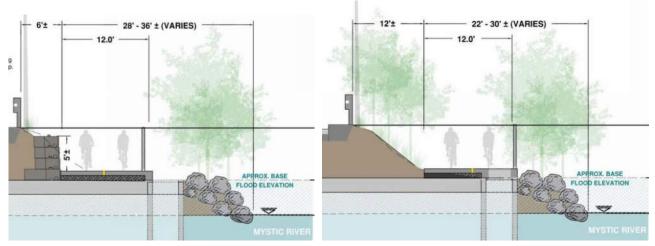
and 32 Alternatives B1 and B2, respectively, at Existing Drainage Culverts
